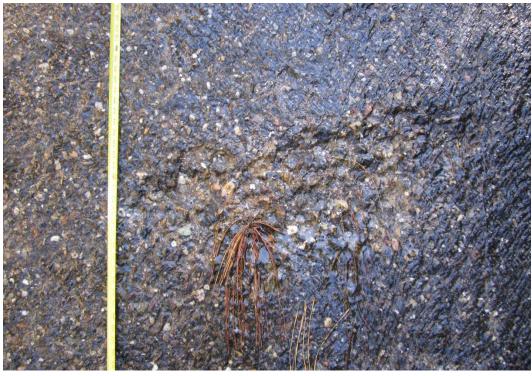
Area of deteriorated concrete at 18.5' downstream of Station 5+00.
